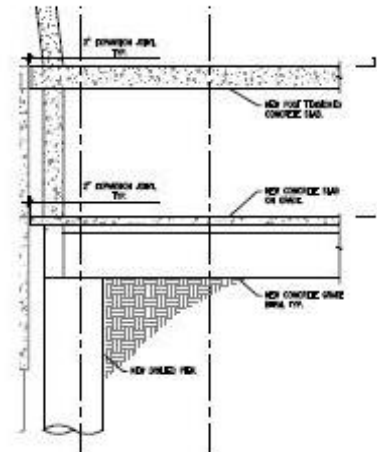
Column adjacent to existing Judicial Center resting on pier foundation
